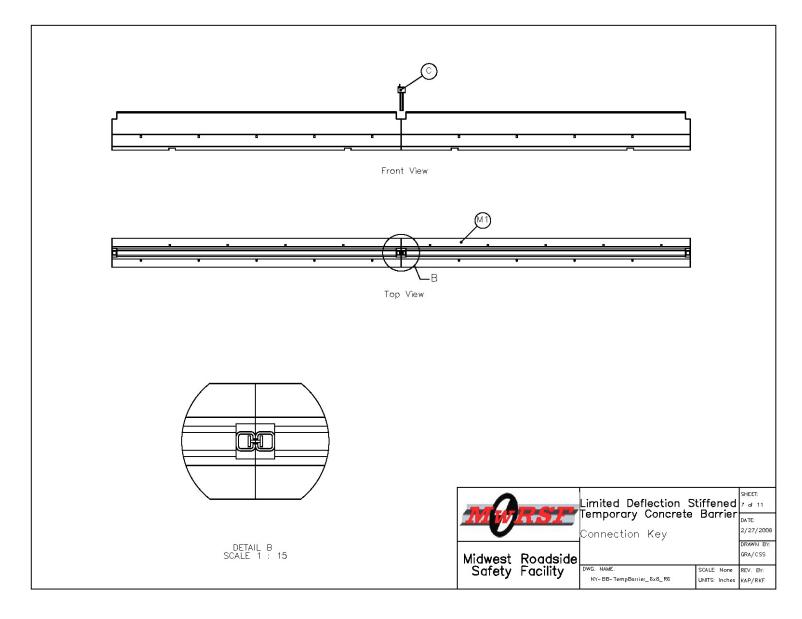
Temporary Concrete Barrier Connection Details (English), Test NYTCB-3
